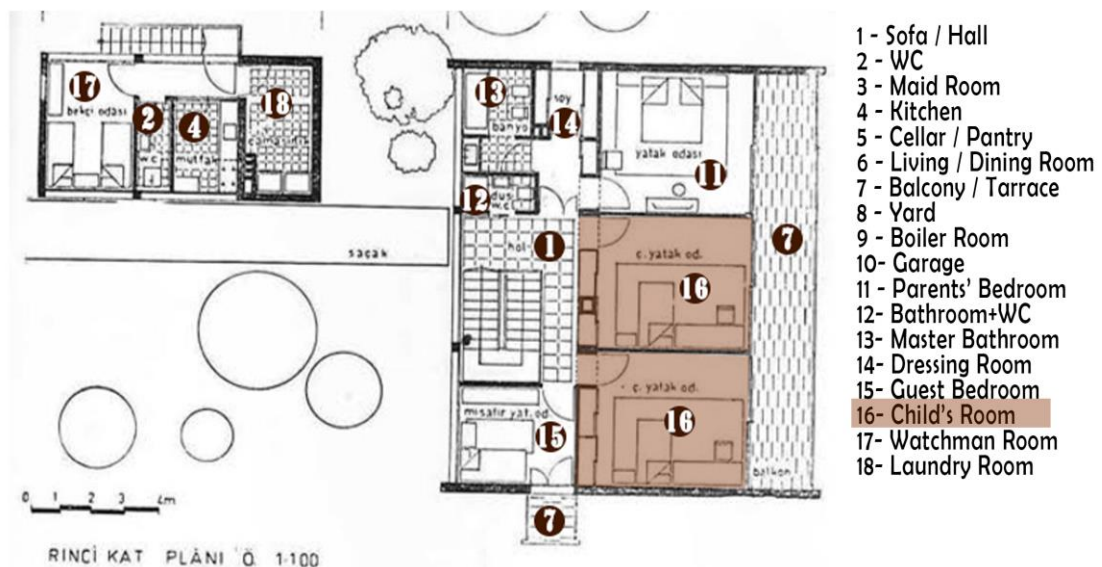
The first floor plan of Özgür Villa, İstanbul (Arkitekt, 1967, 1)
